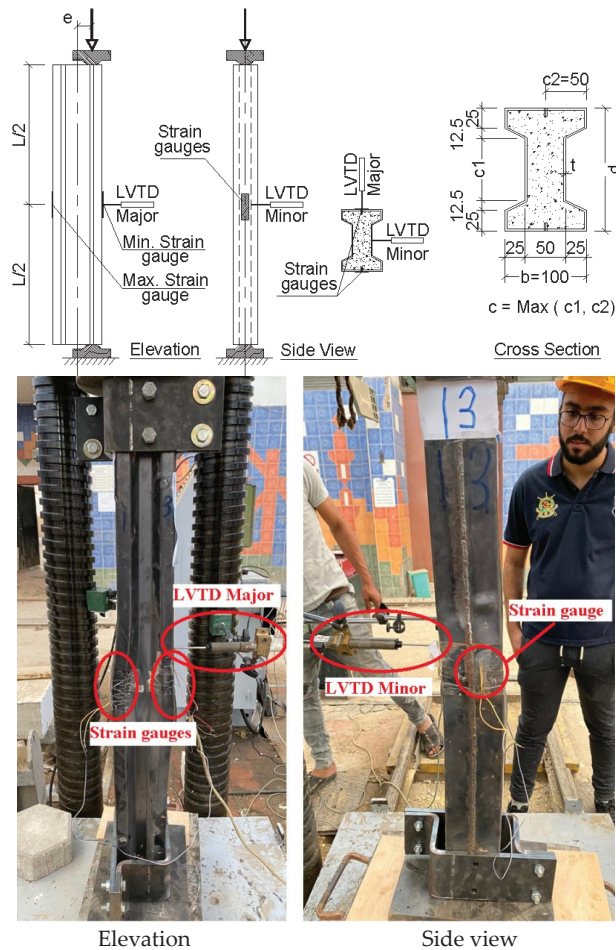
Testing setup, instrumentation and typical dimensions of specimen cross section.
